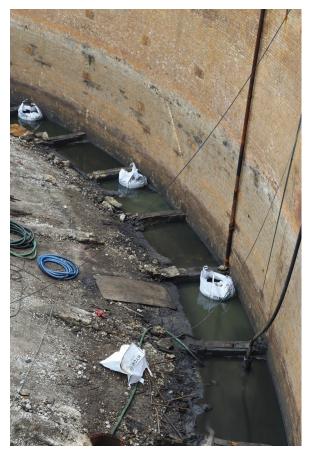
Gasholder No 4, detail view of the concrete blocks supporting the lift grips, from the WNW
